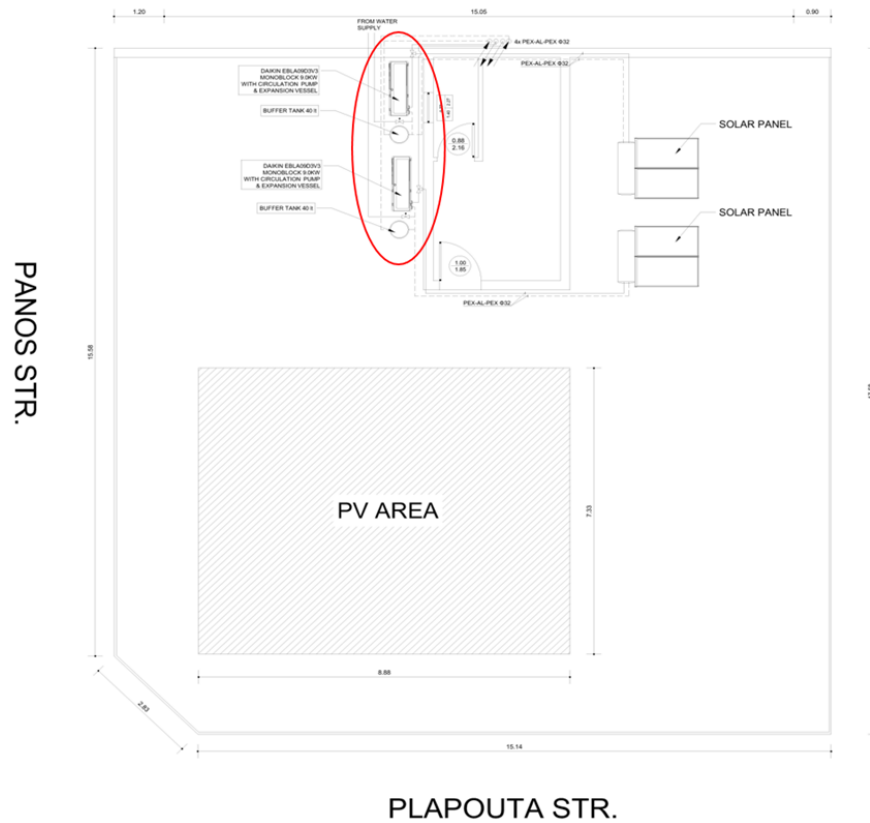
Heat Pumps Positioning On The Building’s Rooftop
